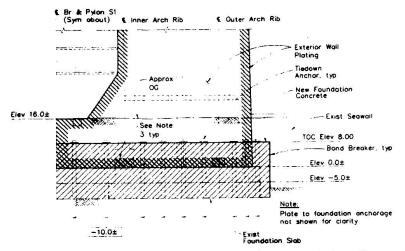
Part North Elevation At Pylon Base Showing Foundation Strengthening
